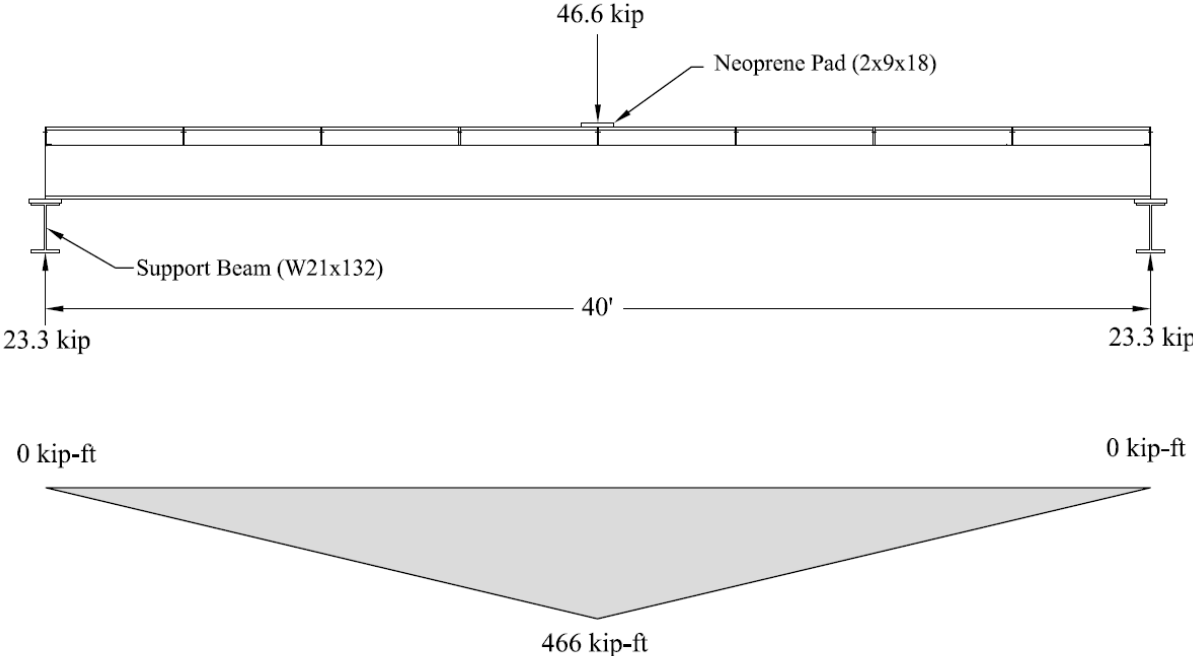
Test setup with point load at mid-span of each girder and corresponding moment
